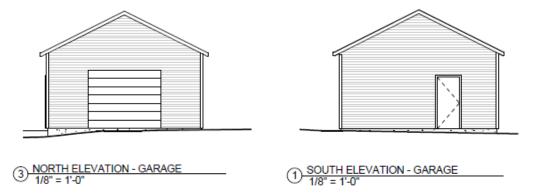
Proposed garage north (left) and south (right) elevations. Not to scale.
